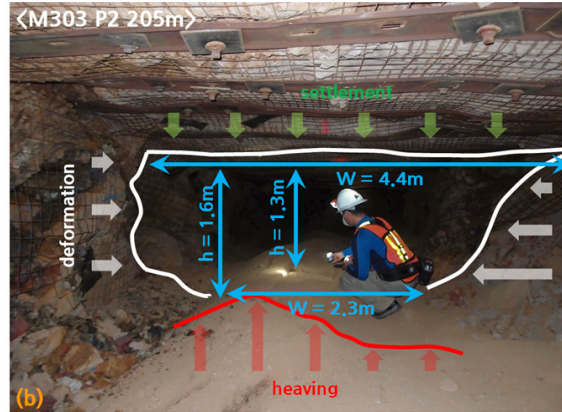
Deformation of mine tunnel by swelling pressure and heaving
